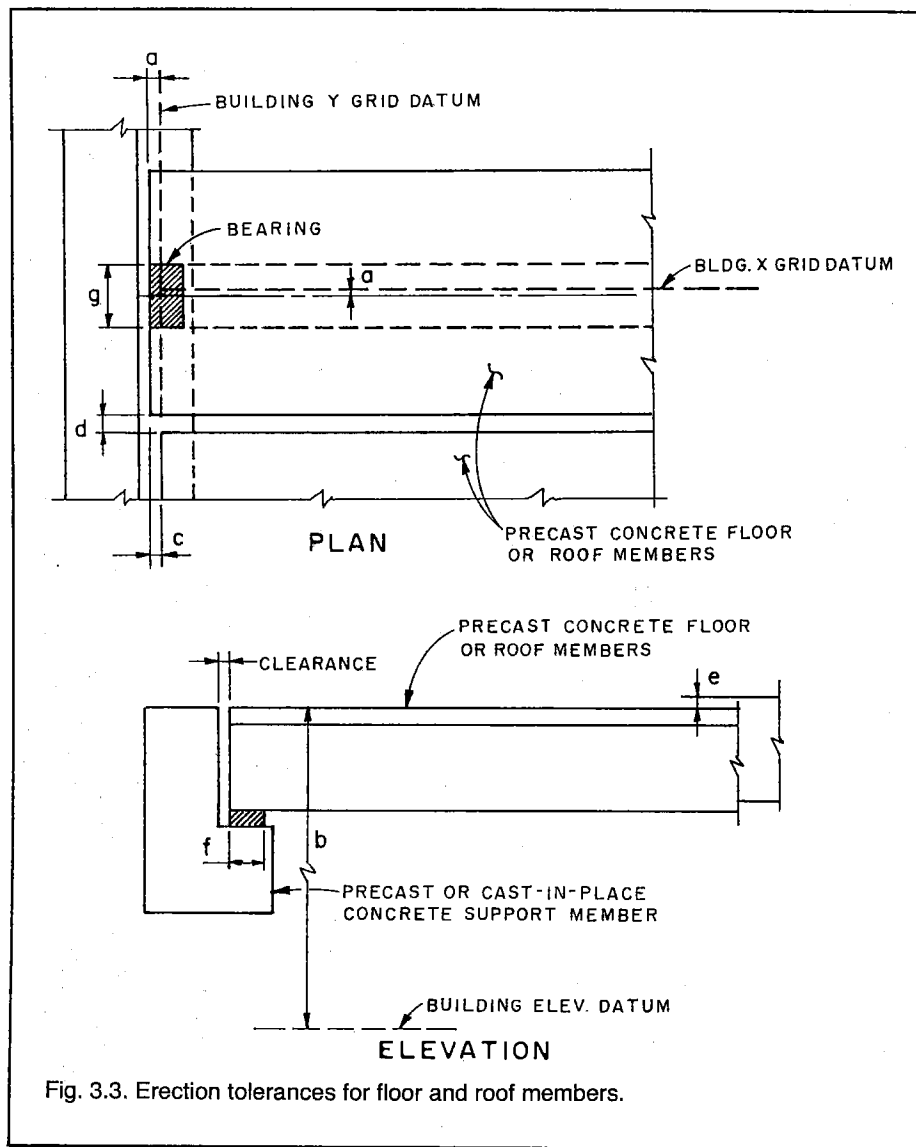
Erection tolerances for floor and roof members.
